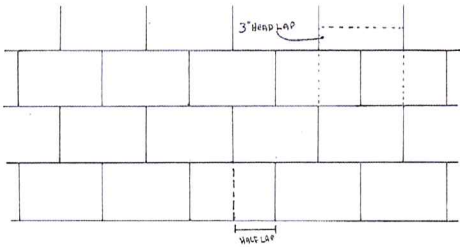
DETAILS & PHOTOGRAPHS - SLATE ROOF TILES, COPPER FLASHING, DORMERS AND RAKE TRIM
